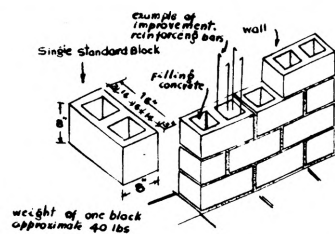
(b) CONCRETE HOLLOW BLOCK WALL
